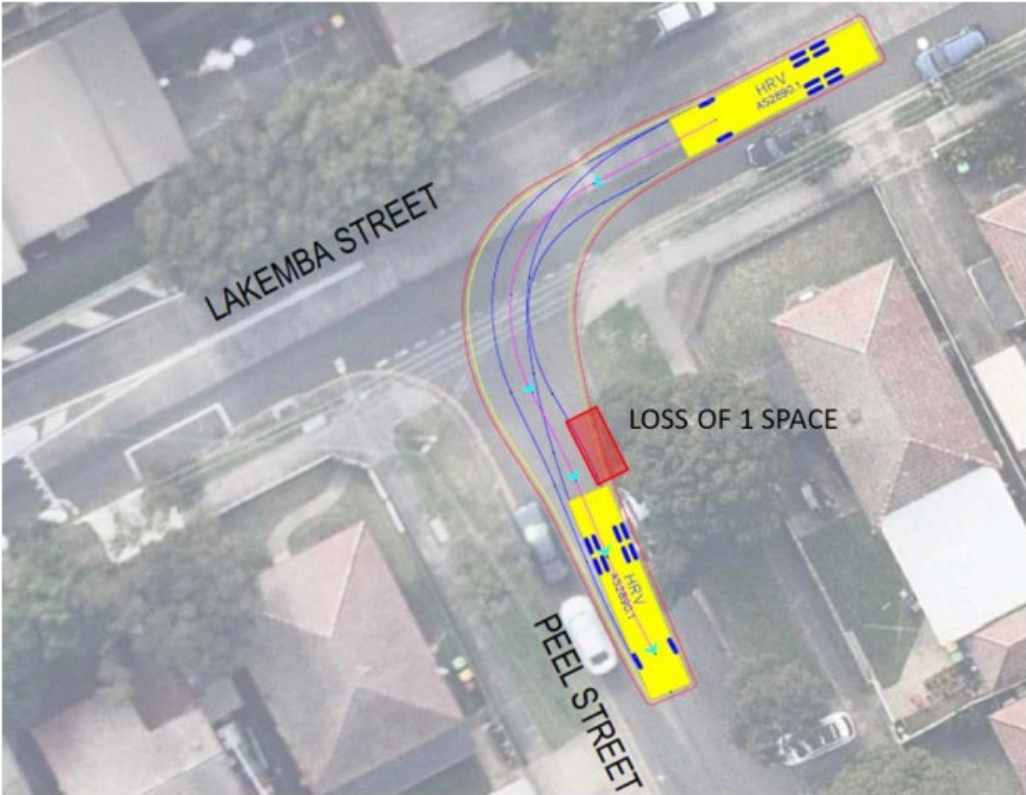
BE7 – M24 14.086D Parking Space Loss
